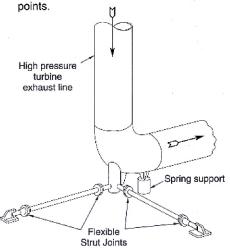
Spring support and restraint for a 30" (750mm) exhaust pipe from a high-pressure turbine. Two Flexible Strut Joints permit vertical expansion movement of the exhaust pipe, but prevent any horizontal movement of the vertical section pipe.
